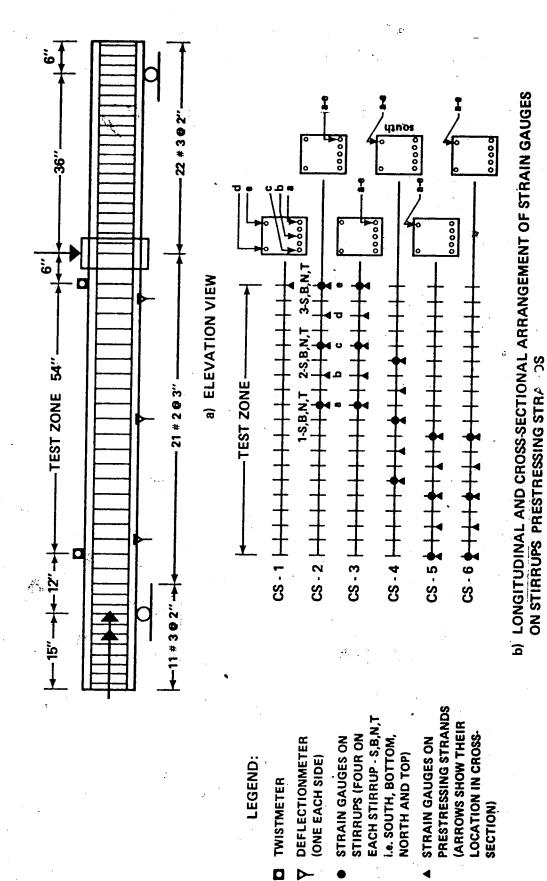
ELEVATION VIEW AND INSTRUMENTATION OF CS GROUP BEAMS
